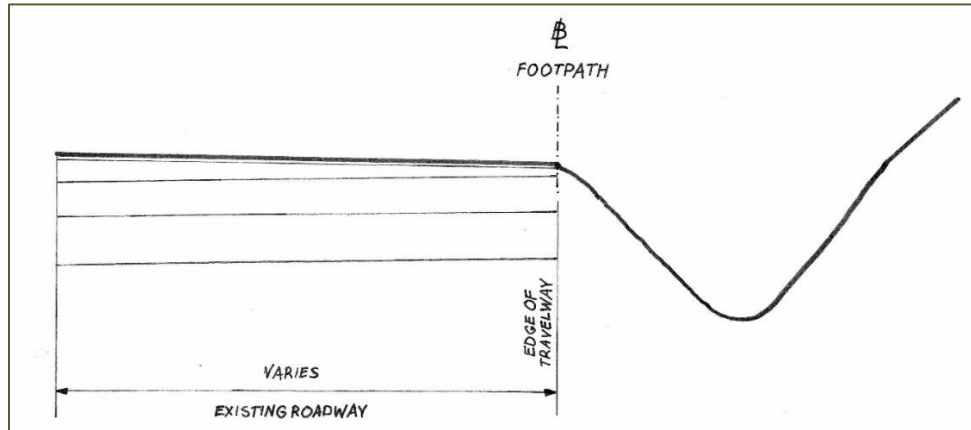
Existing Typical Roadside Ditch Cross Section of Georgetown Pike
